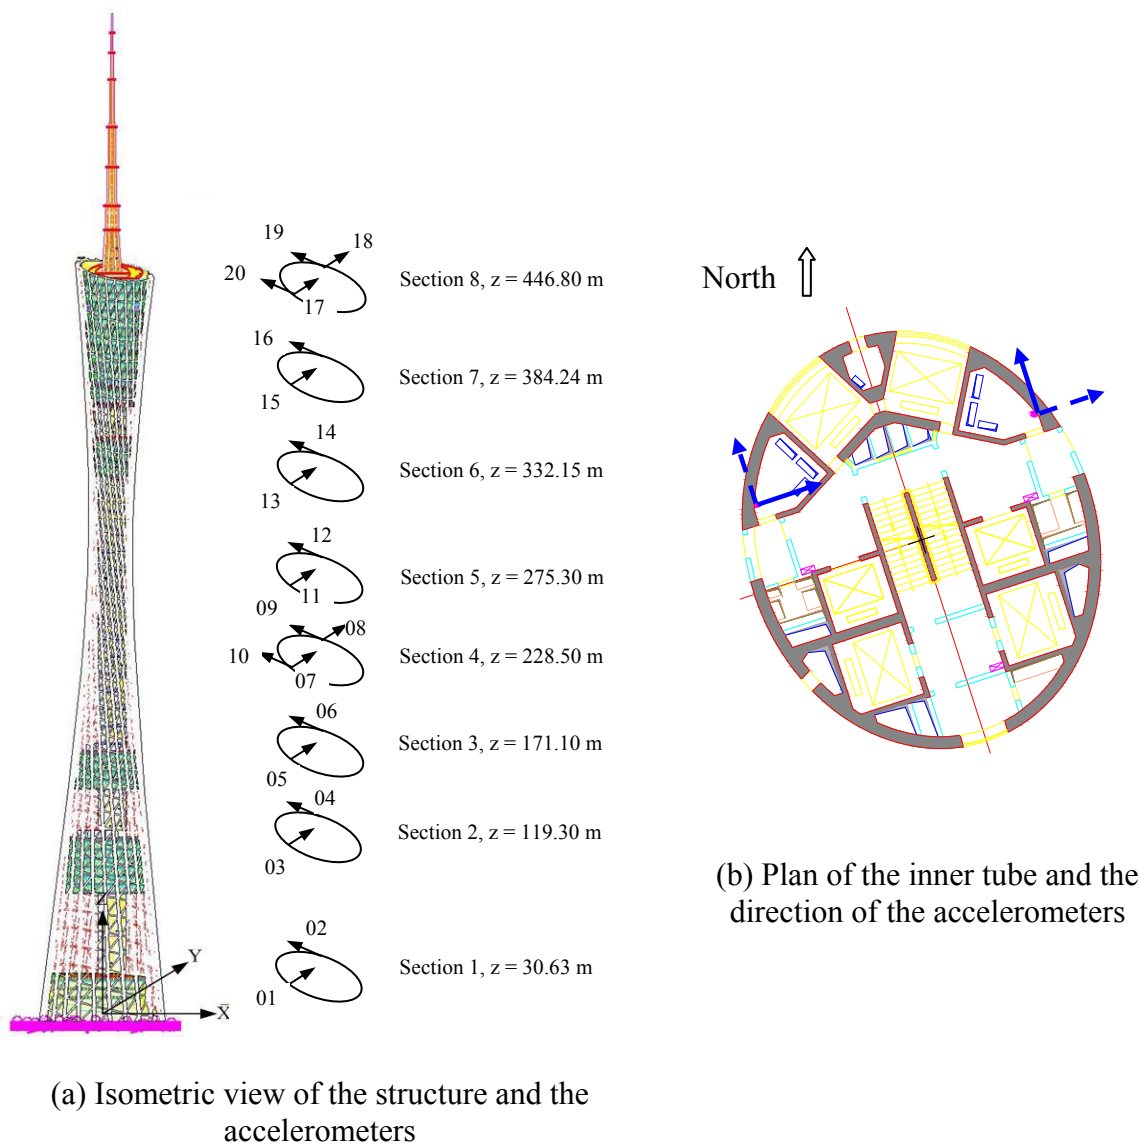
The Guangzhou New TV Tower and the layout of accelerometers
